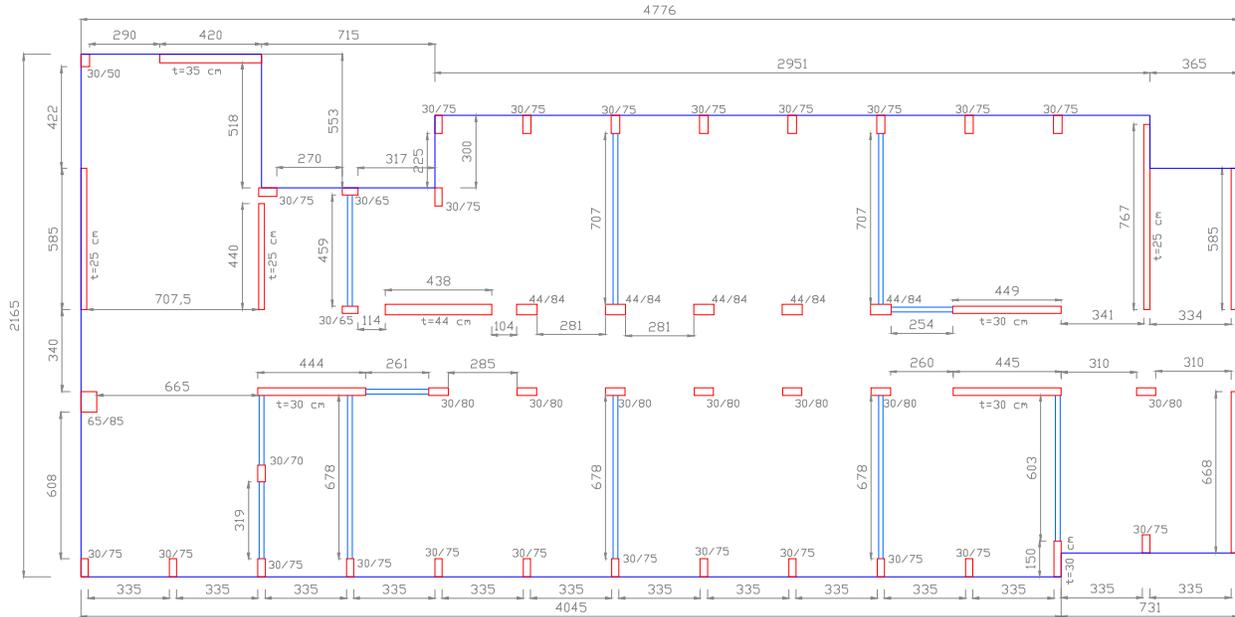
Structural floor plan for building C-17-03. Masonry wall thickness was 0.19m. Dimensions are in cm.
